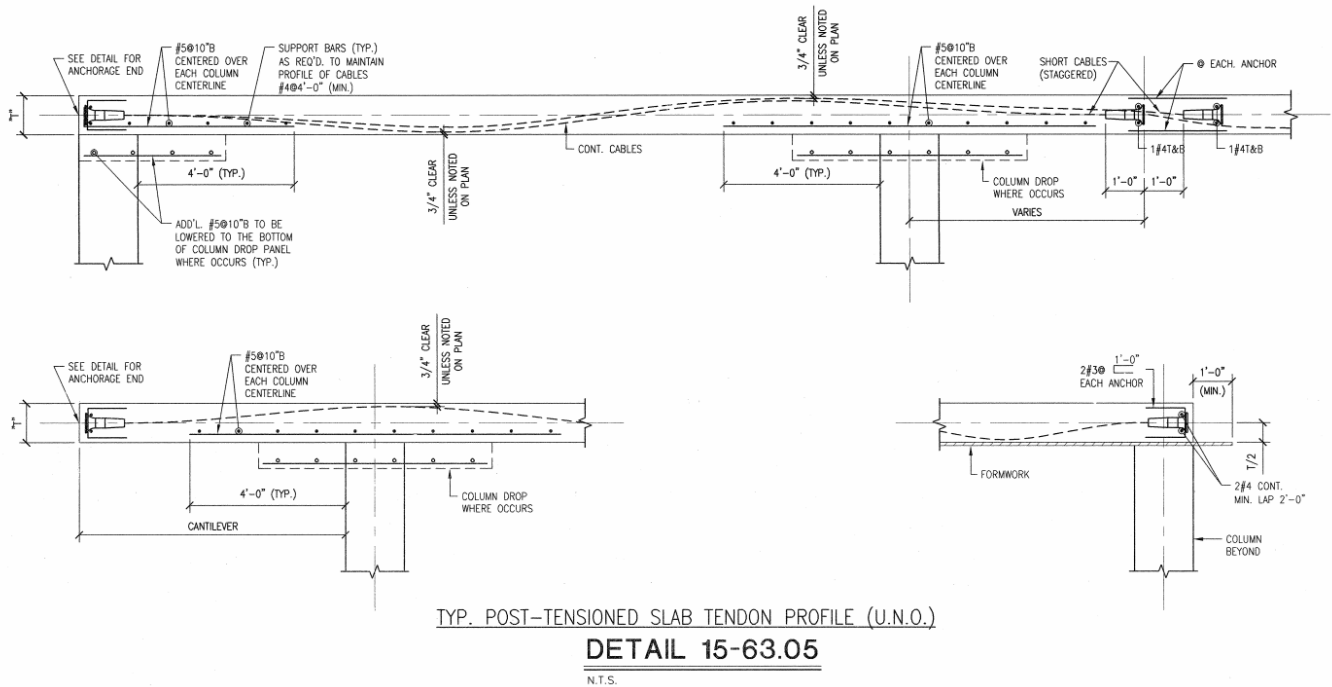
Typical Post Tensioned Slab Tendon Profile
